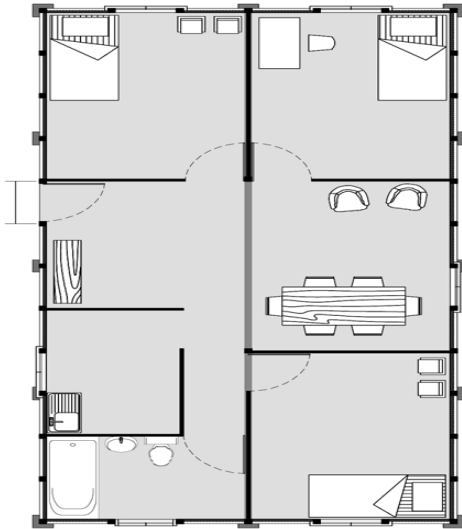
Internal layout of the prefabricated kit-house unit at Thelwatha
